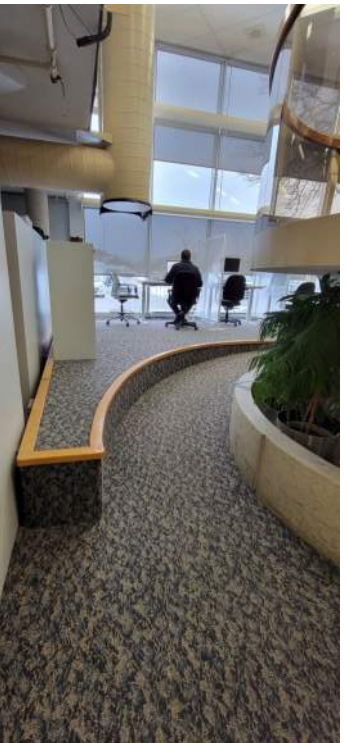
DEMOLISH INTERIOR RAMP, REMOVE CARPET AND WOOD TRIM
